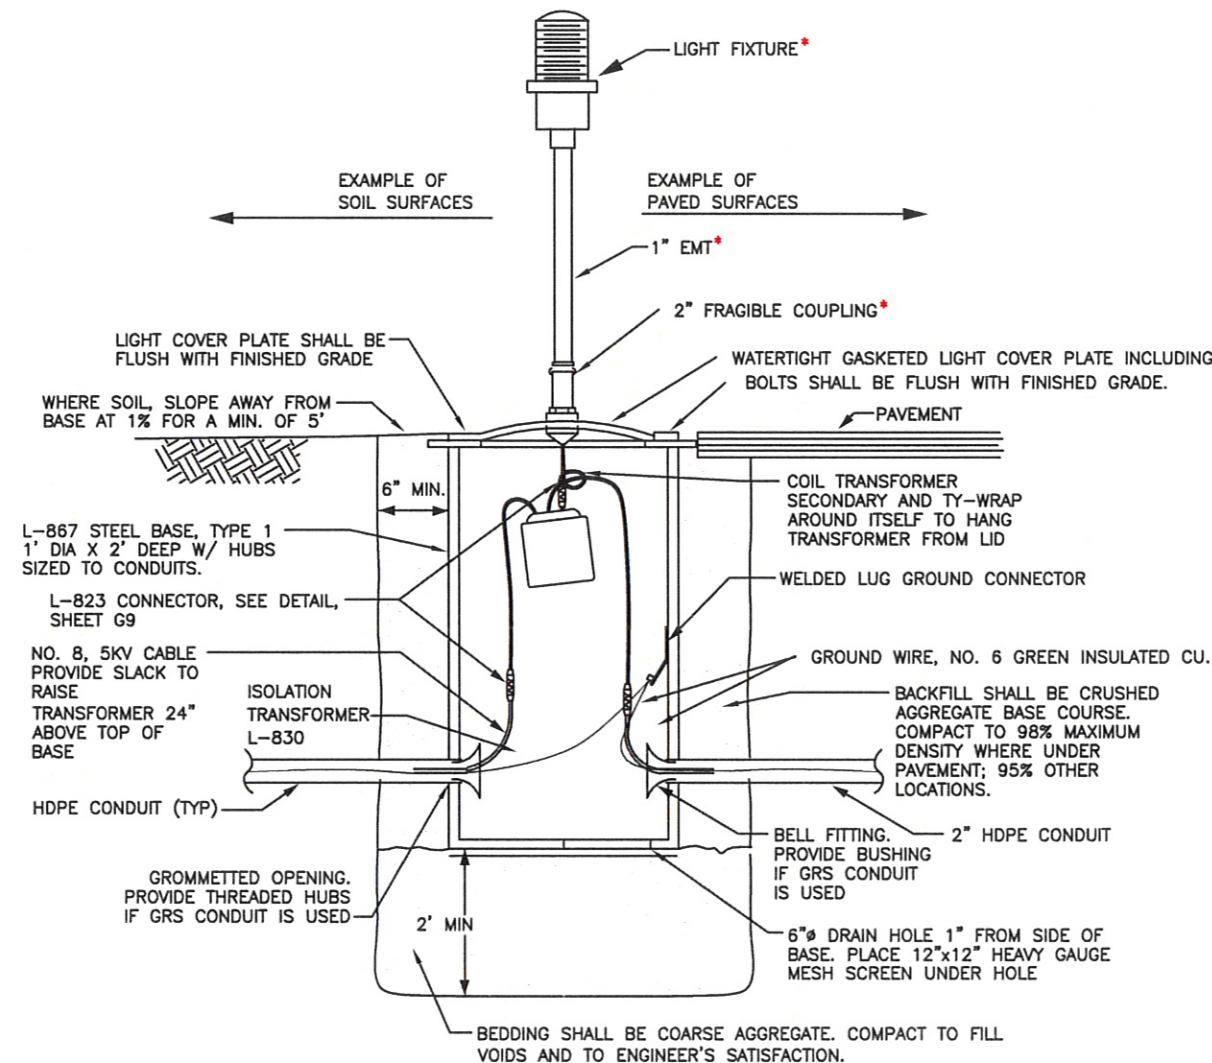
DETAIL: NEW CONDUIT INSTALLATION (TYP)
